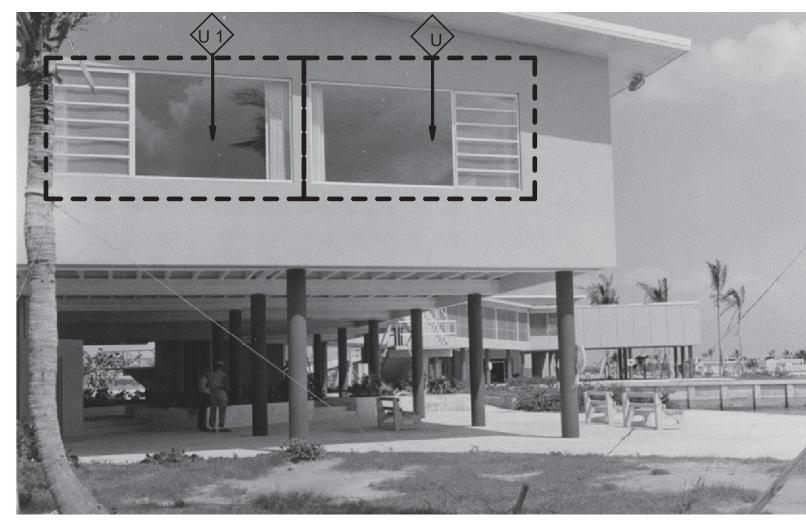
SOUTH SIDE ELEVATION OF VISITOR CENTER WITH THE ORIGINAL WINDOWS (1959)
